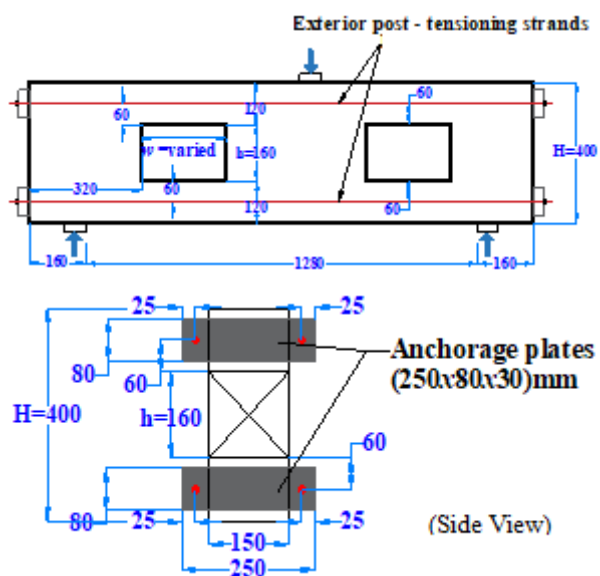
Layout of a typical tested beam for beams of Group B (beams strengthened with horizontal post-tensioning strands)
